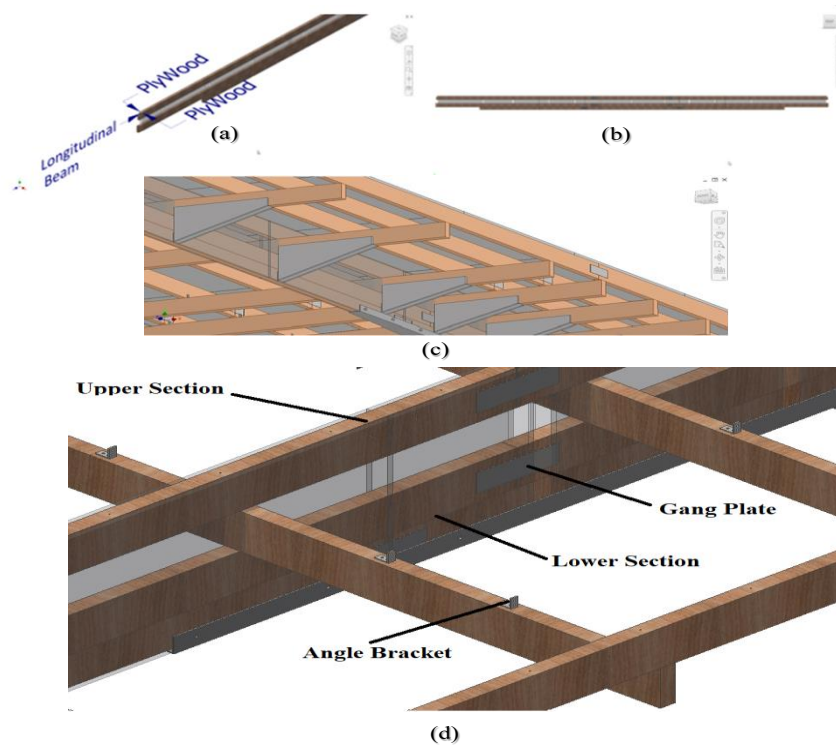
Component of the chassis design: a) Plywood; b) Side view of the longitudinal beam; c) Lateral beams reinforcement; d) Upper and lower section, angle bracket, gang plate, and lateral beam.
